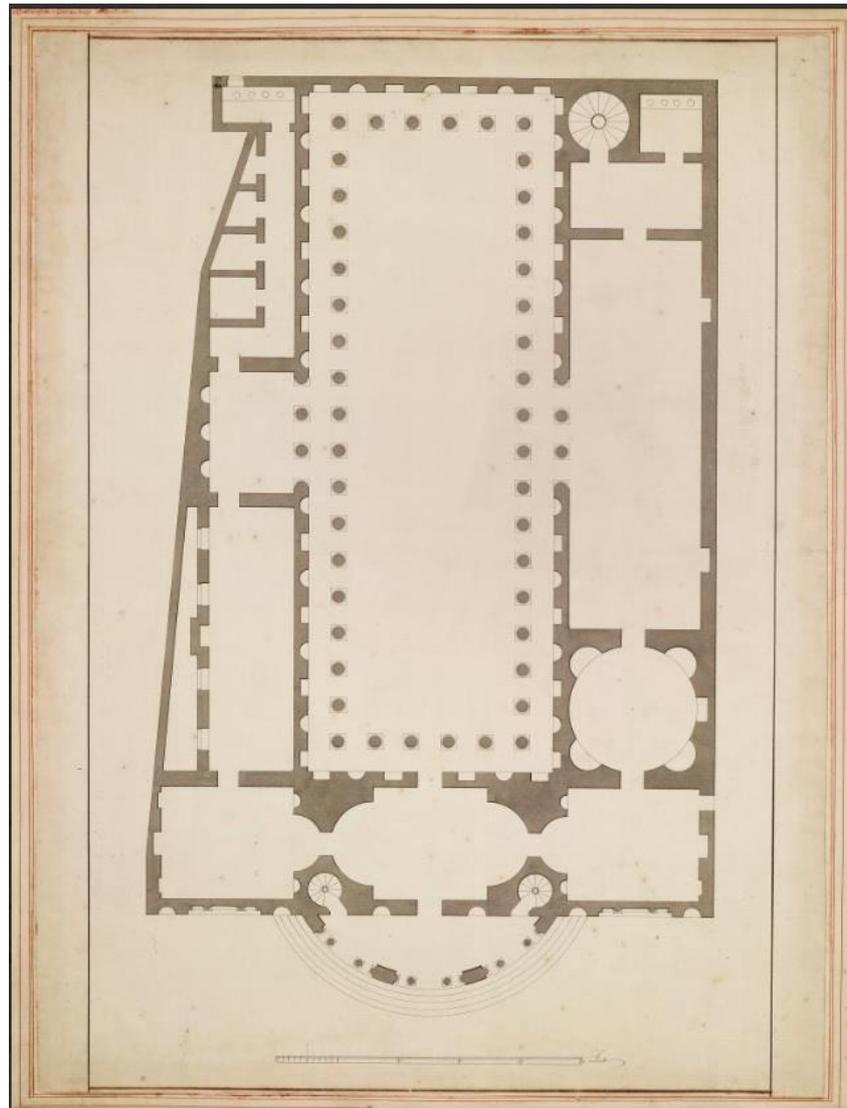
Floor plan of The Assembly Rooms, York: copy of Lord Burlington's plan design, 1730. Image courtesy of RIBA Collections, ref. no. RIBA29053.
